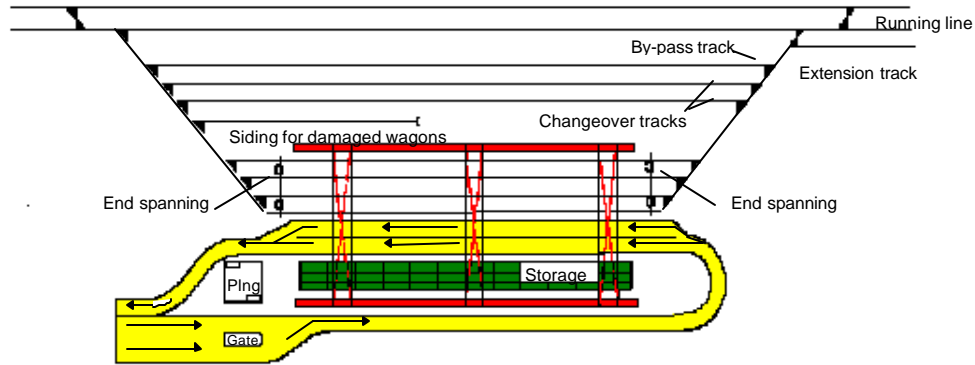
Layout of Deutsche Bahn (German Railways) Standard Module
